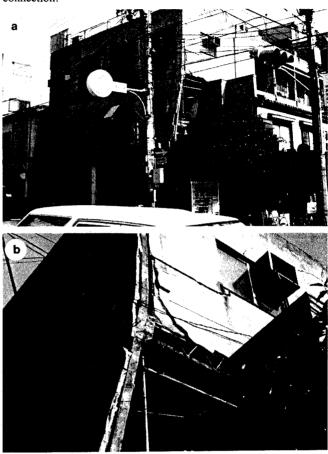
Tension failure of the bottom chord of a moment-connected floor truss in a three-storey residential building: (a) overall view of the building; (b) close-up of the failed connection.
